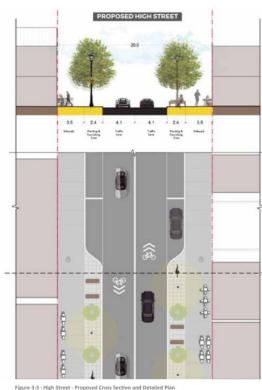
High Street - Proposed Cross Section and Detailed Plan
